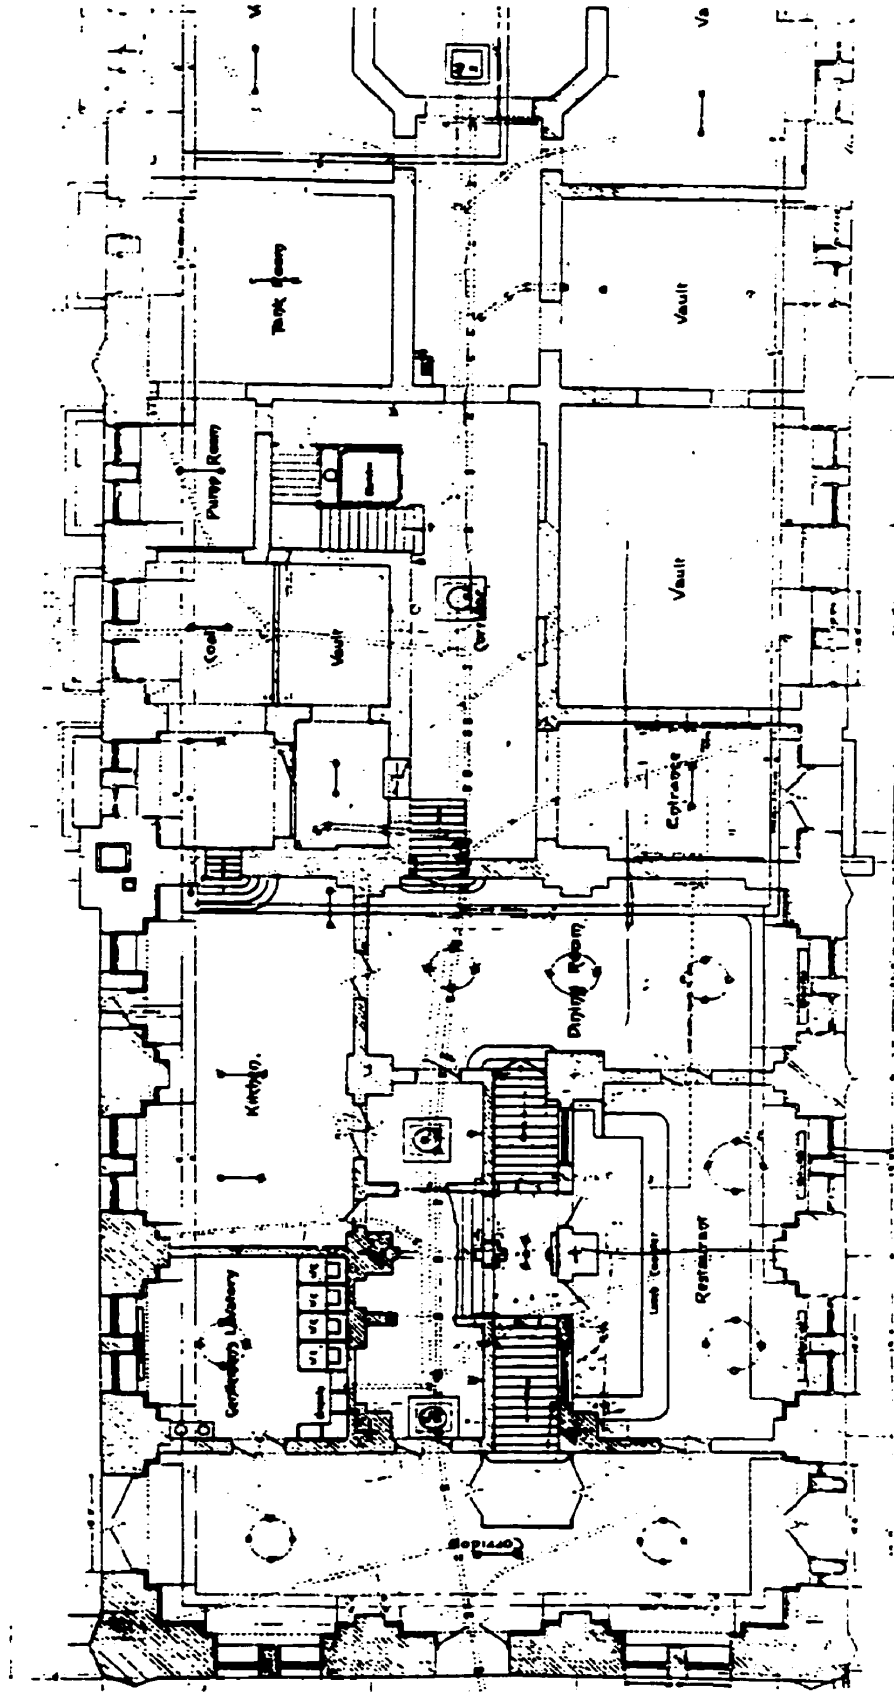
Basement plan, Windsor Station, showing access to the train shed; dining and men's lavatory facilities. Source: CPA.
